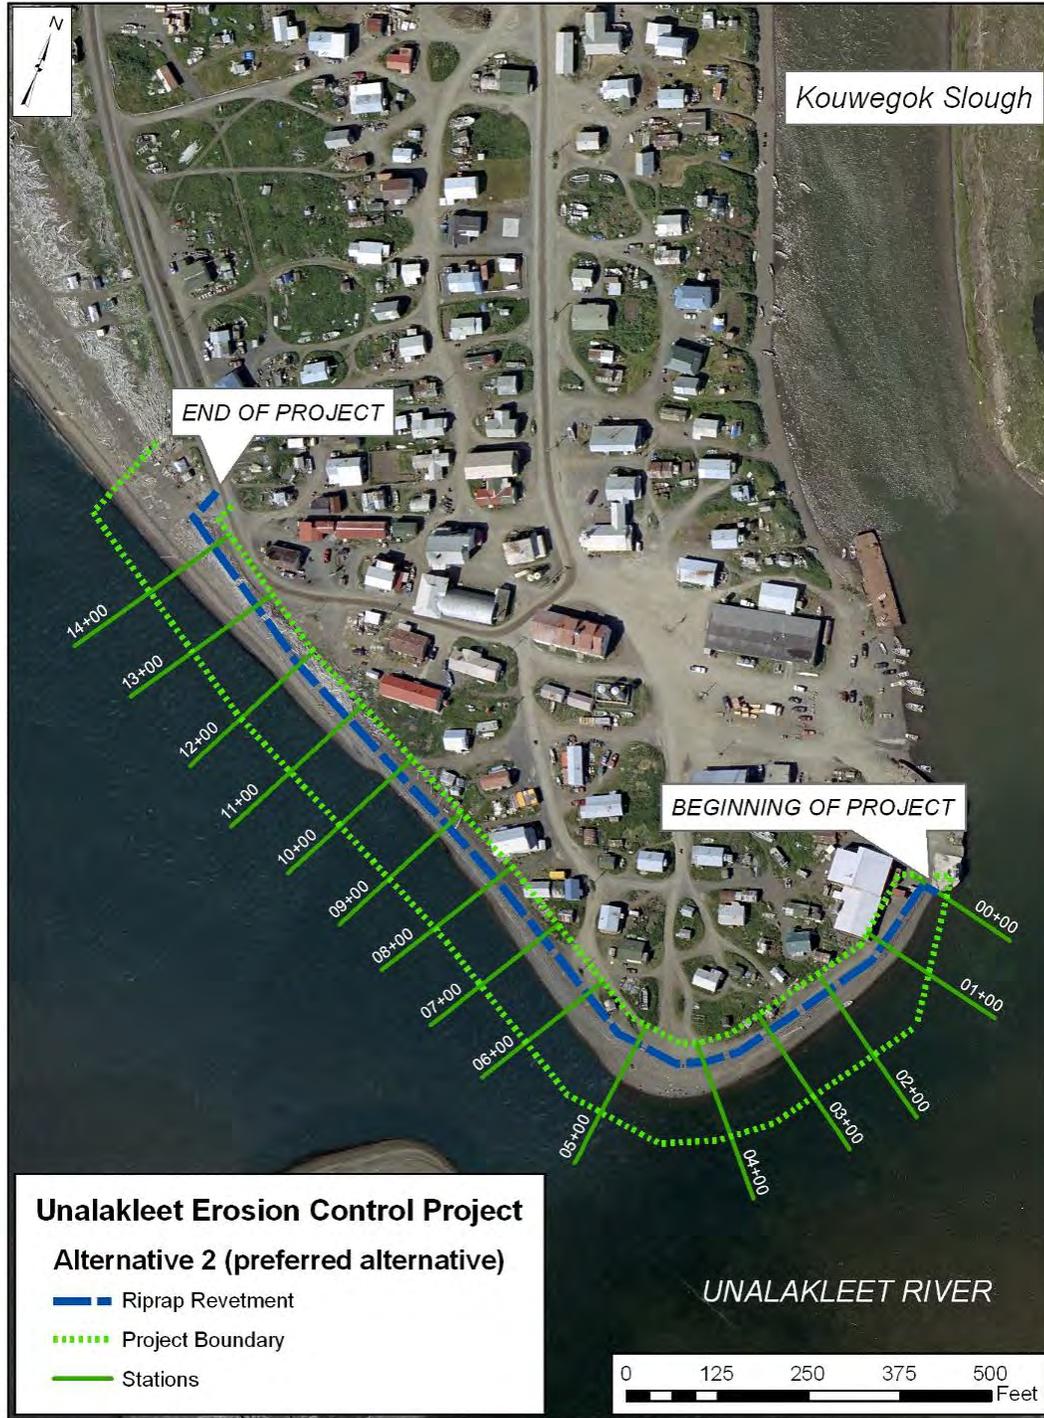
Location of proposed Alternative 2-Riprap revetment.
